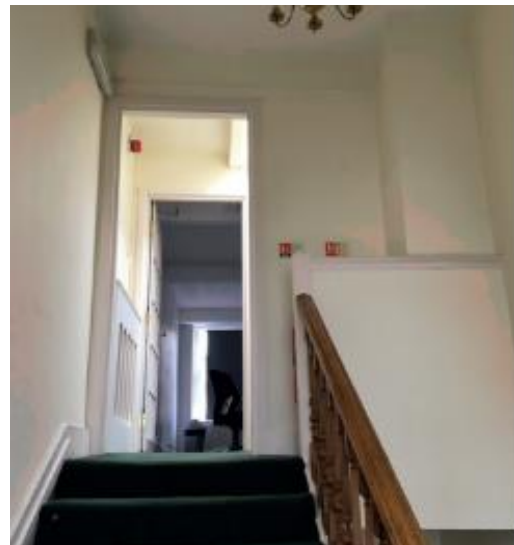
Image showing 3<sup>rd</sup> floor modern staircase and landing at 3<sup>rd</sup> floor level.
